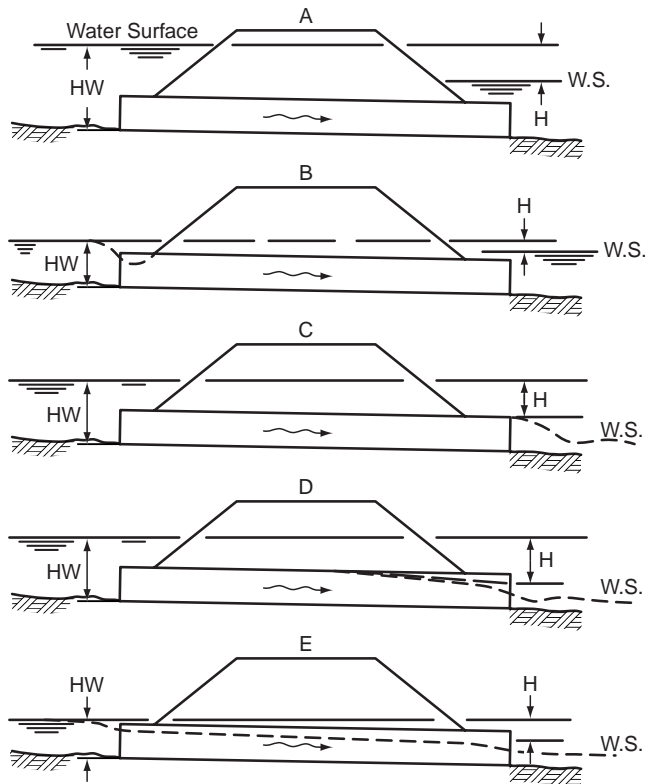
Types of outlet control: (A) inlet and outlet submerged, pipe flow, (B) inlet unsubmerged and outlet submerged, with surface drop at the entrance and contraction, (c) inlet submerged, pipe flow along barrel, no tailwater, (D) inlet submerged and outlet unsubmerged, outlet depth greater than critical, (E) inlet and outlet unsubmerged, subcritical flow over entire length, critical condition at outlet. (Source: Normann et al. 1985.)
